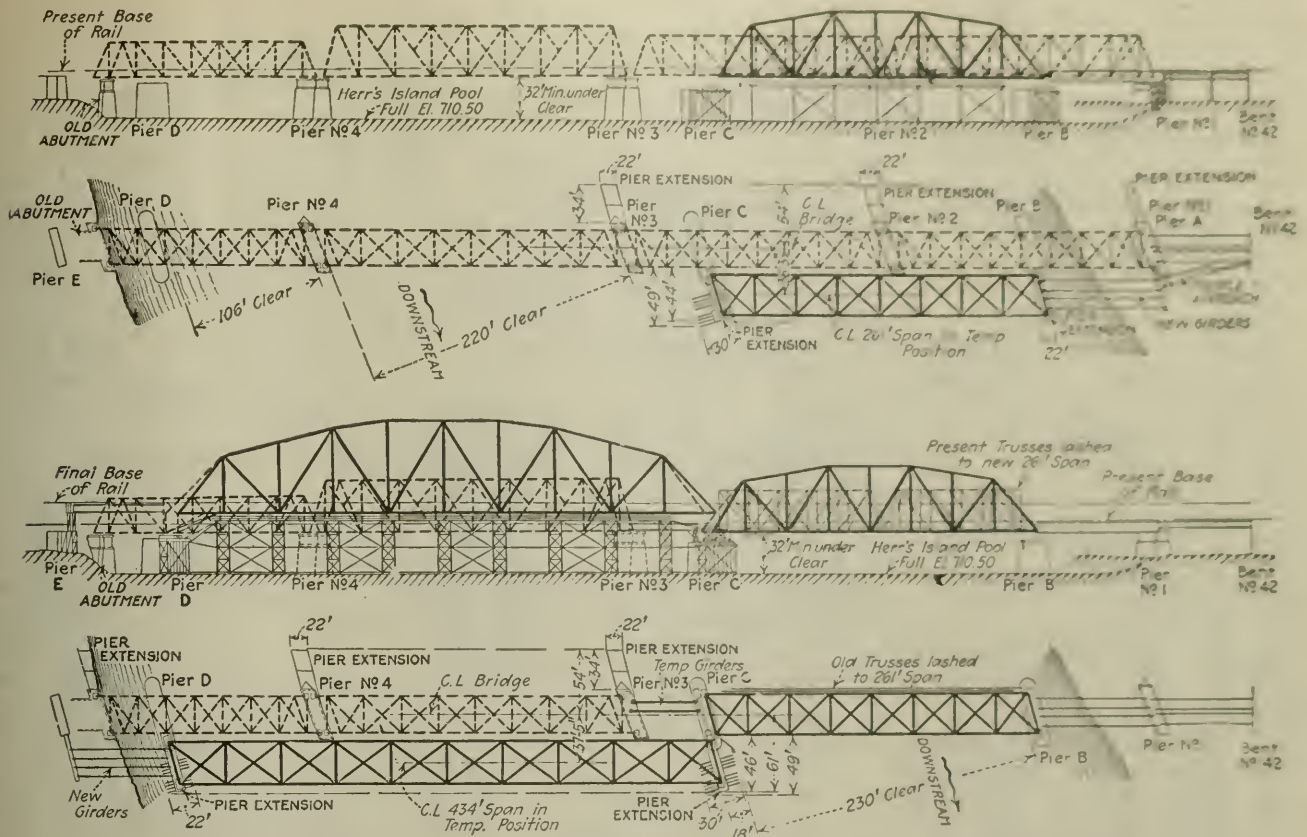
CHARACTERISTIC STAGES OF ERECTION AND REPLACEMENT OF 33RD ST. BRIDGE
